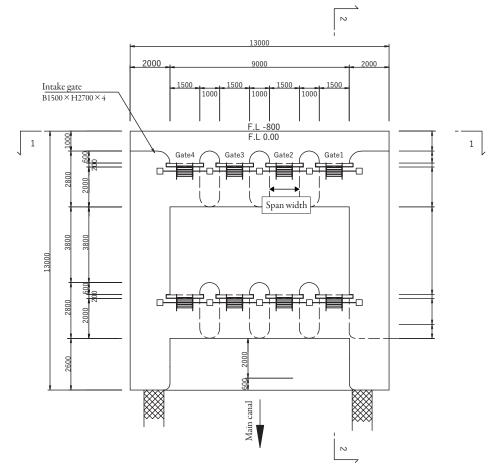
Example Plane Drawing of the Double Flush Board Method Intake Gate 3)
